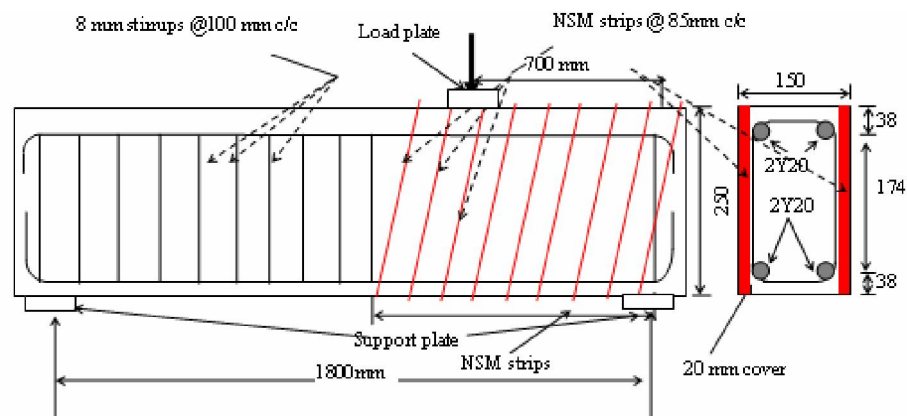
Loading arrangement of test beam with NSM steel strips (B1-SS)
